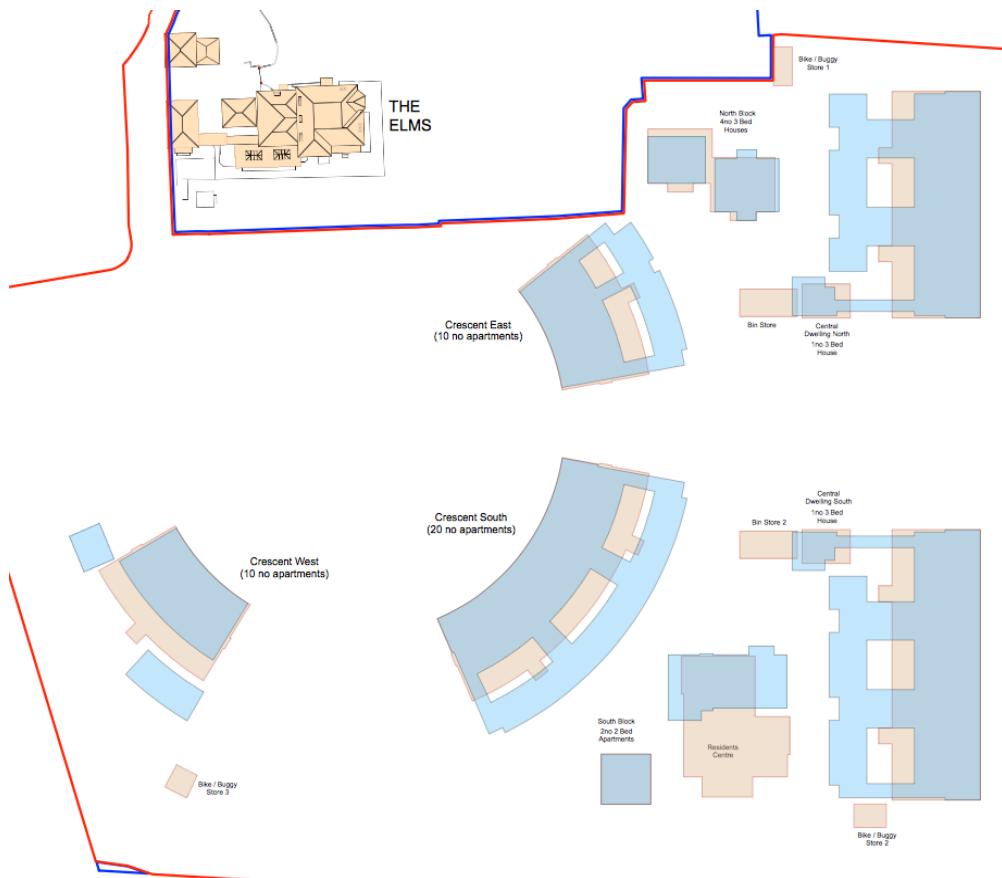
Extract of Building Comparison Outline Plan (Plan No. 1981-112 Rev. A).
